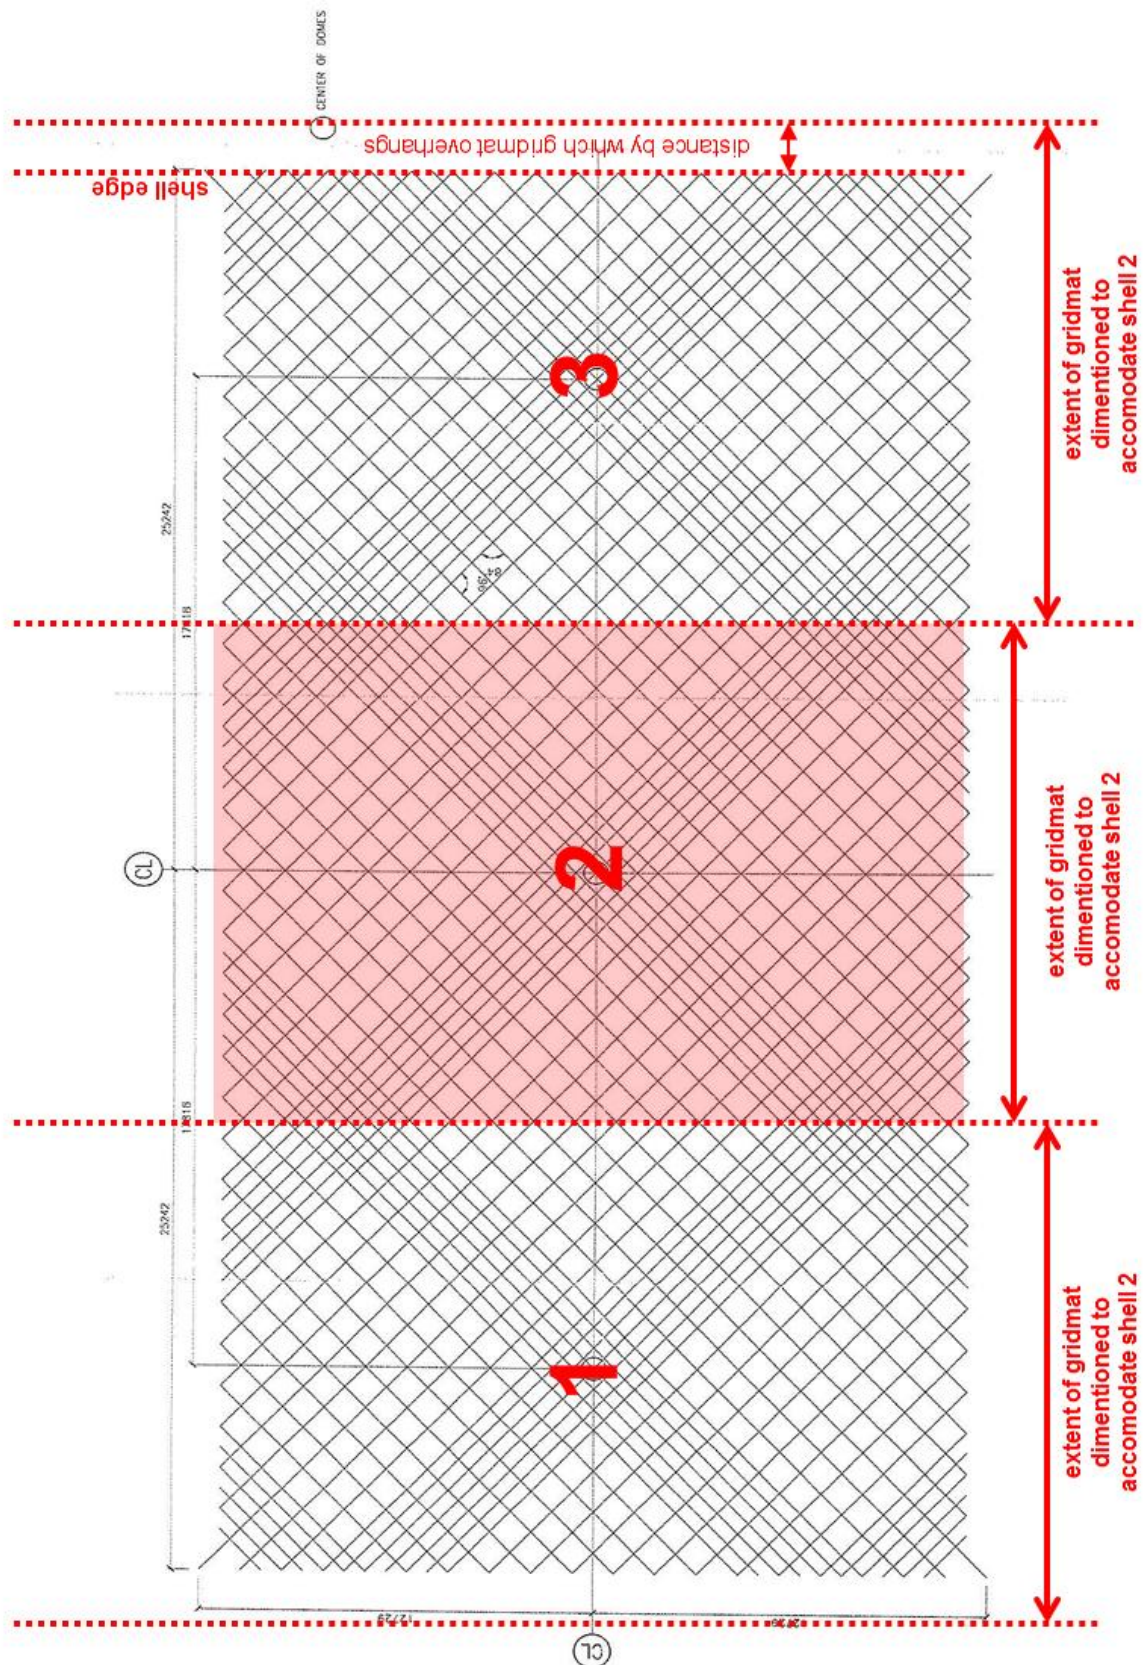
Plan of gridmat is divided into 3 narrower sections. It is observed that although tri-bulbous, the middle section is found to be wider than the flanking bulbs. The mat must therefore be made to the dimension of shell 2. When sections 1 and 3 are cast, the edges will terminate before the edges of gridmat formwork terminates (similar to test shell 4 free edge).
